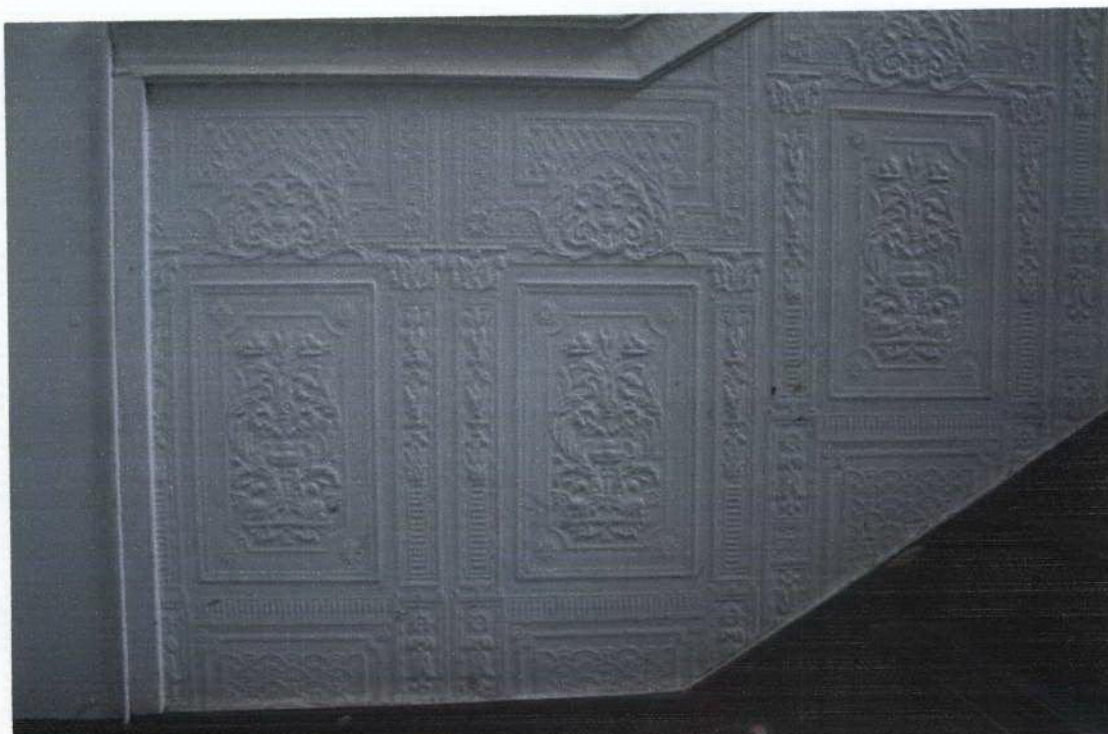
Wall covering First floor stair (Typical of staircase areas)
